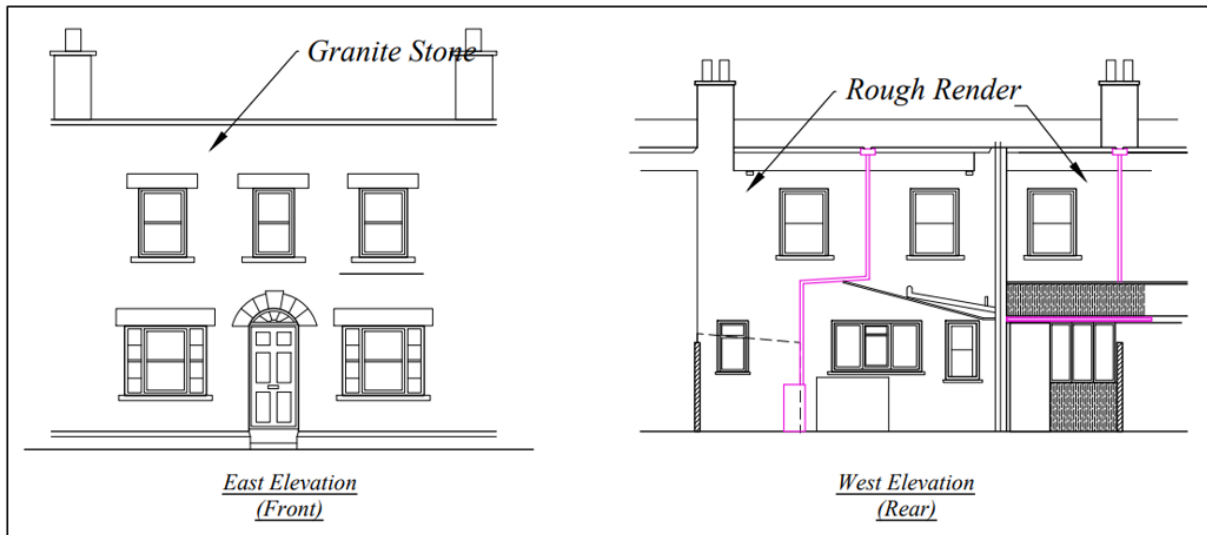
Architect's drawings of the existing front and rear elevations of St Eia (Paul Osborne).
